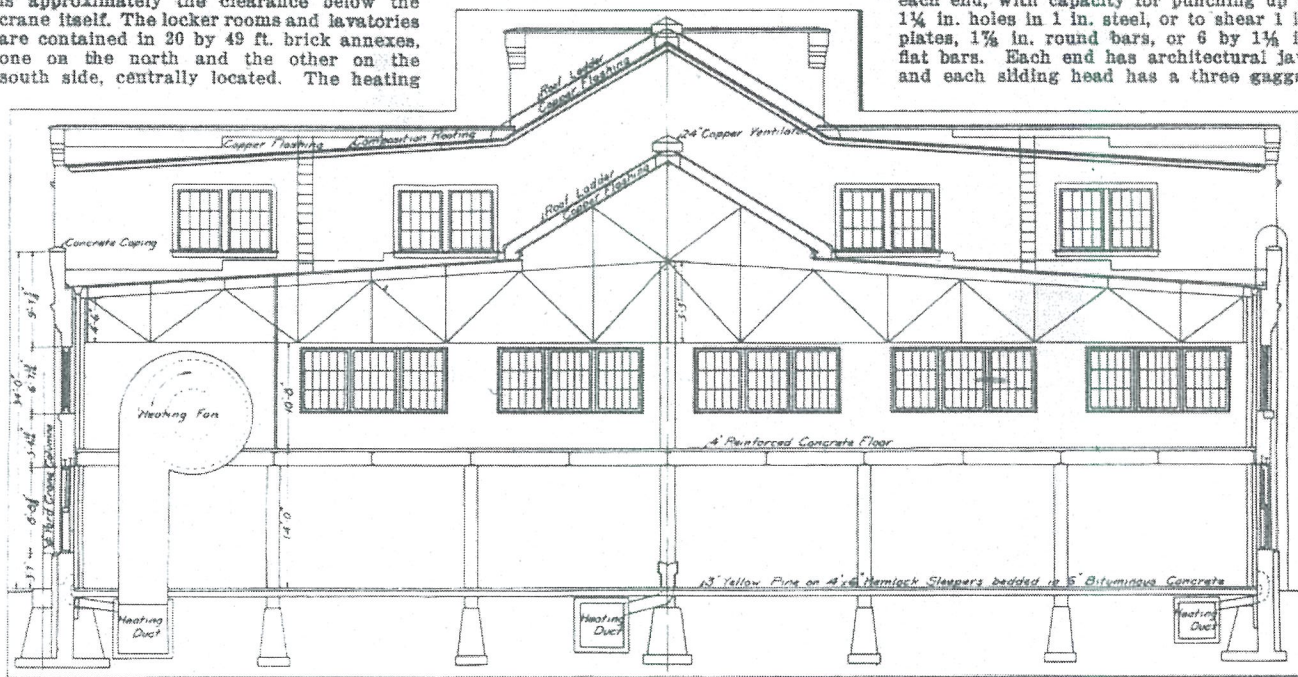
Cross Section of One of the Passenger Car Buildings, looking towards High End.
